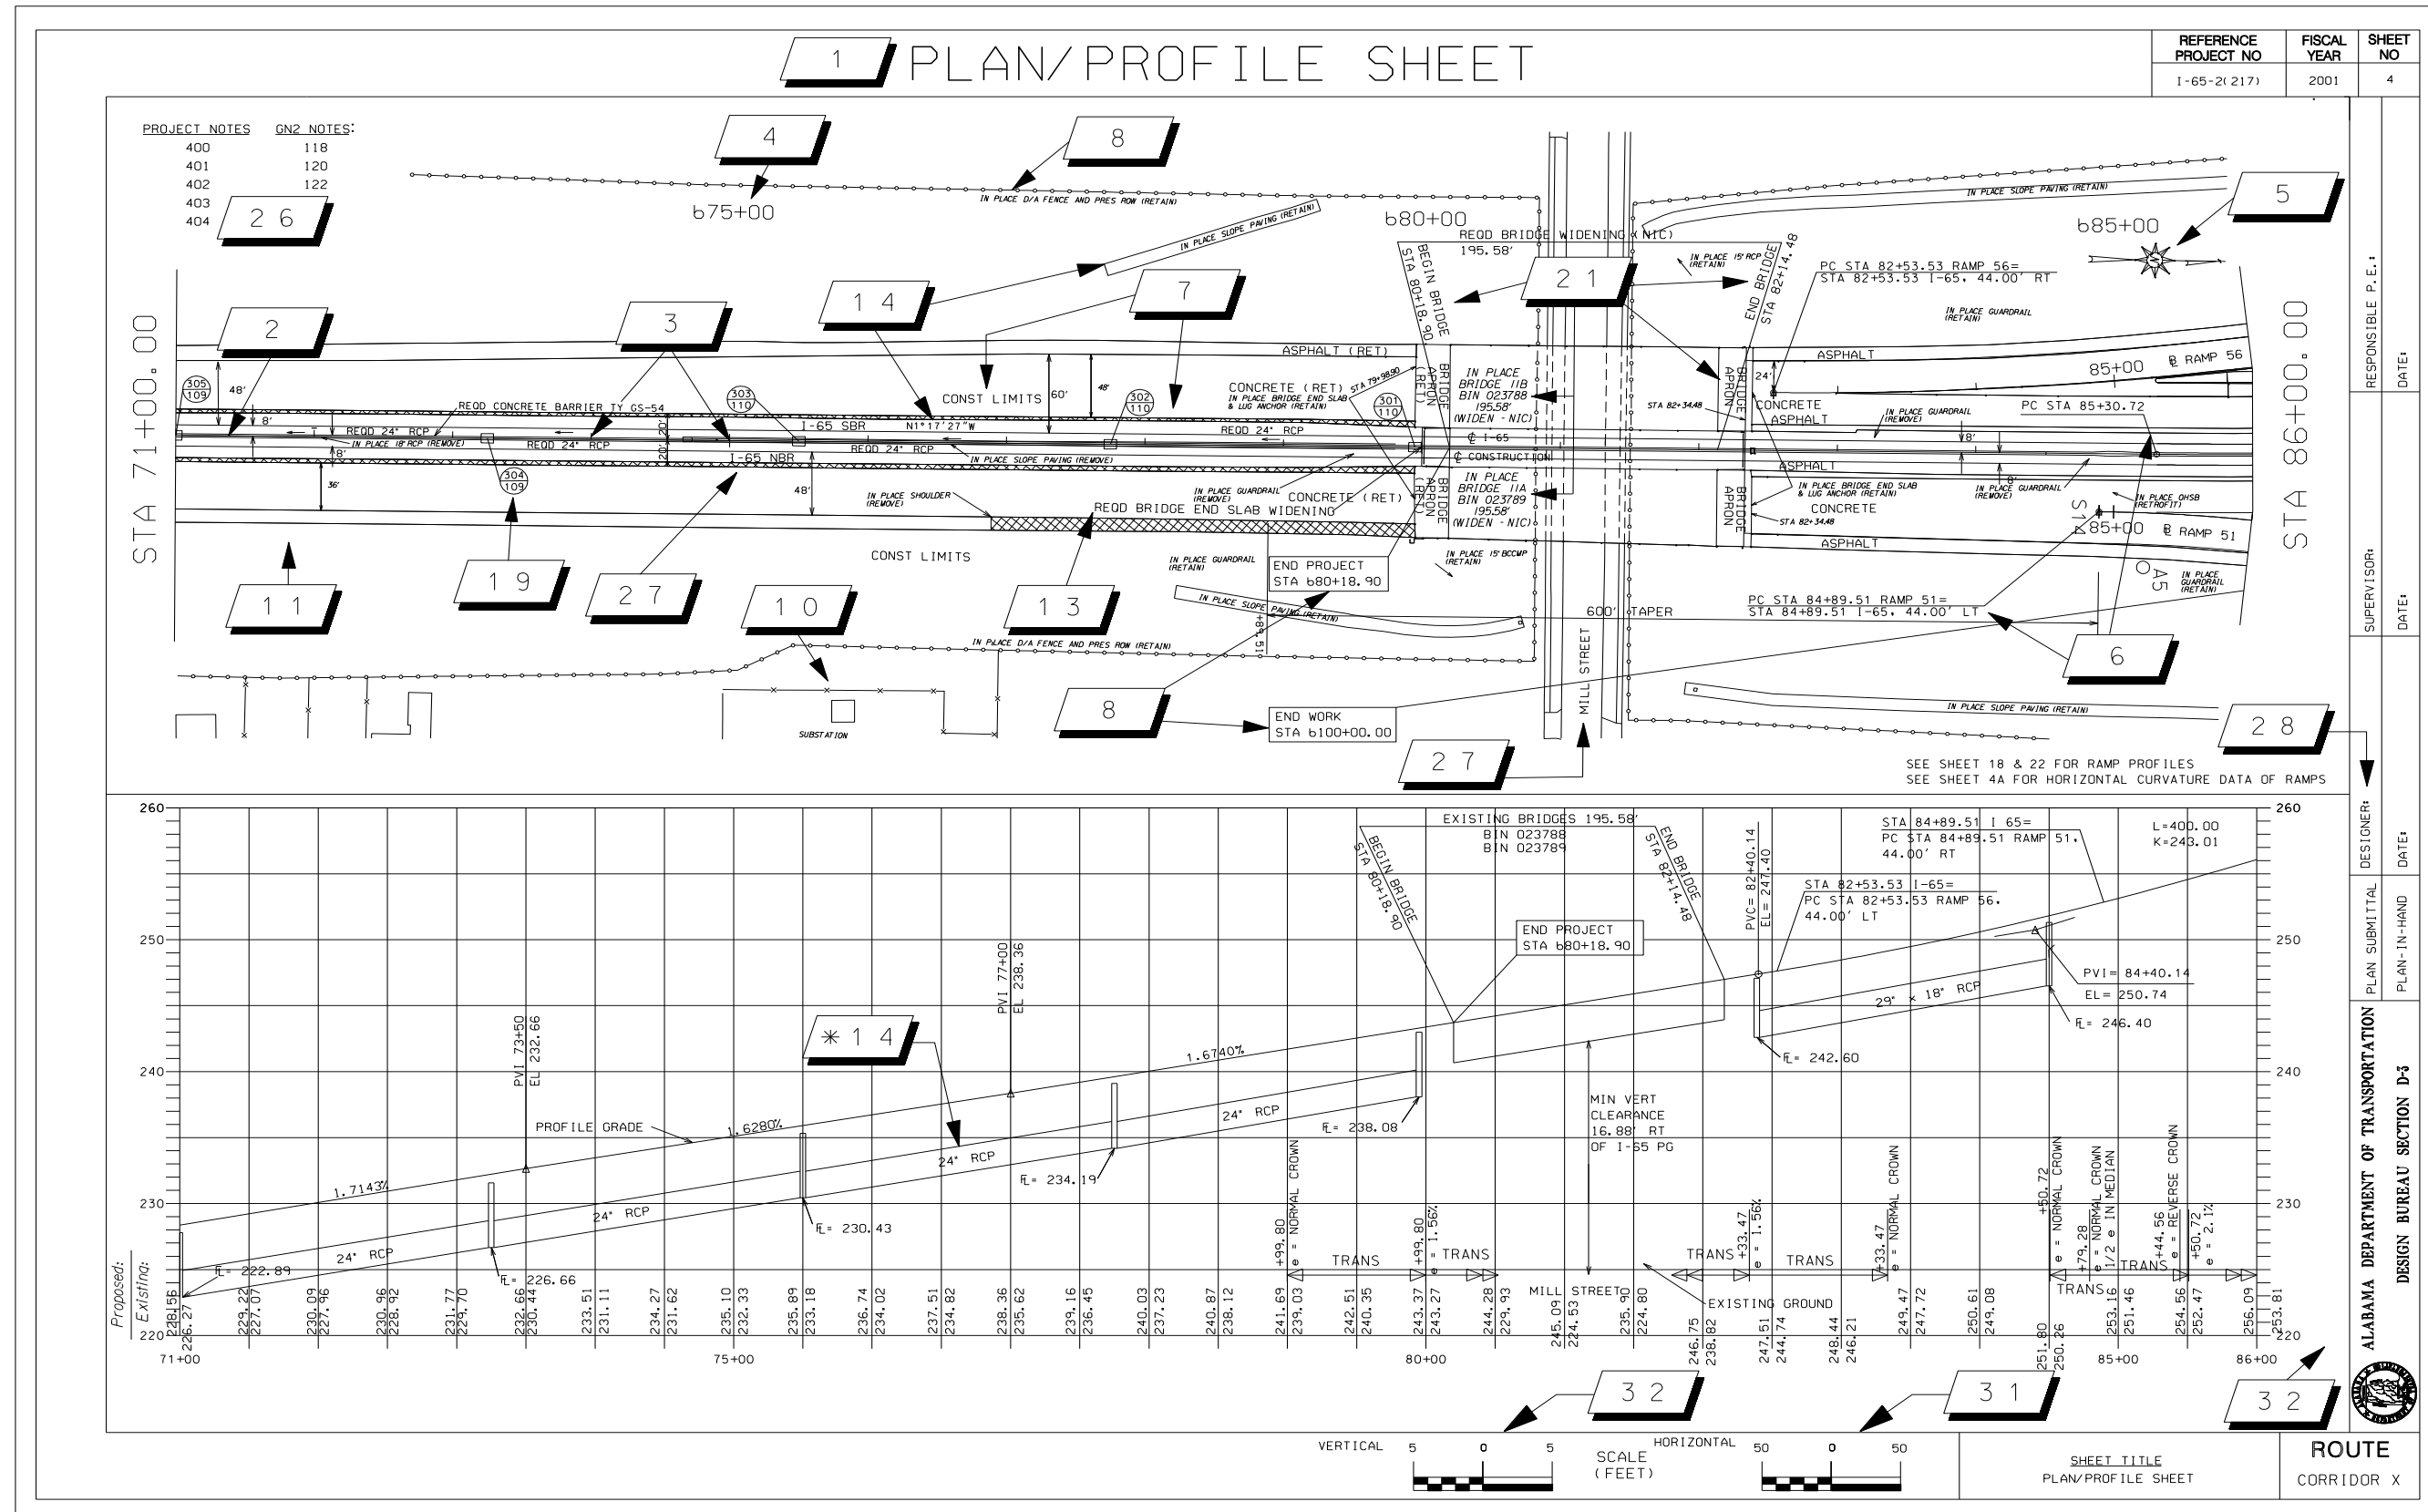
PLAN/PROFILE SHEET_12.15.08.dgn 1/22/2009 1:59:35 PM
